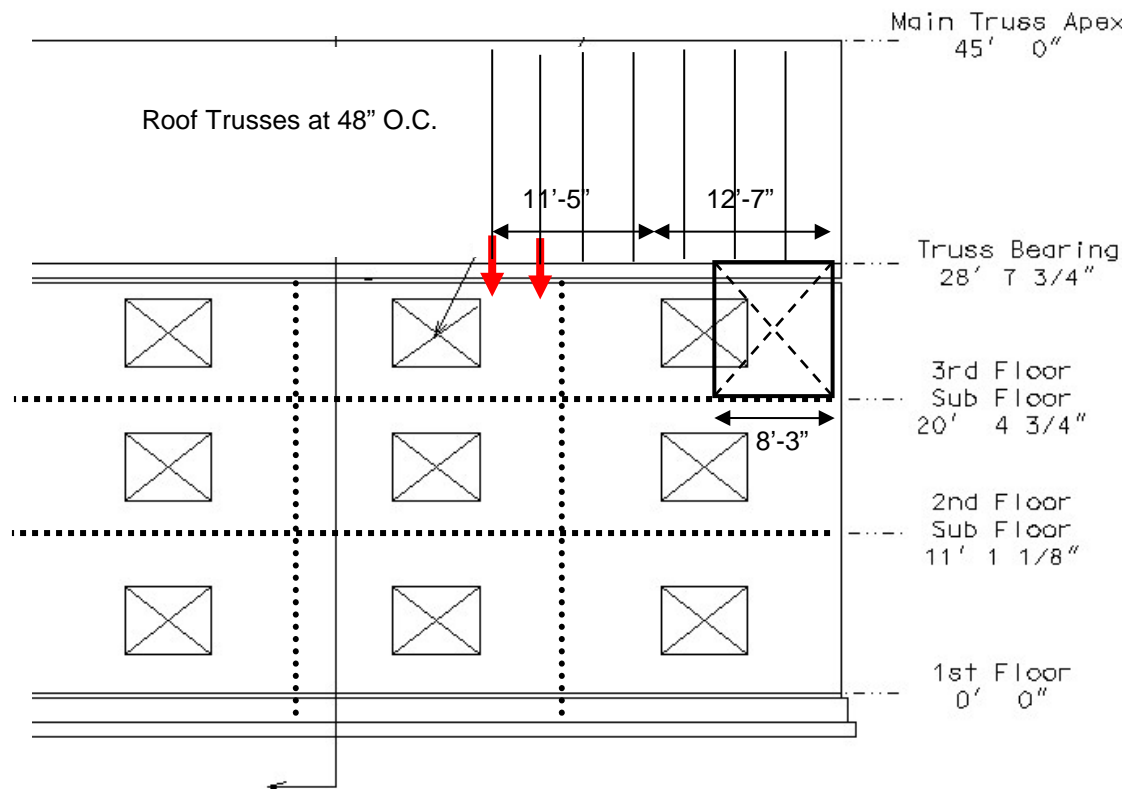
Exterior Corner Wall Removal Tie Down Locations
